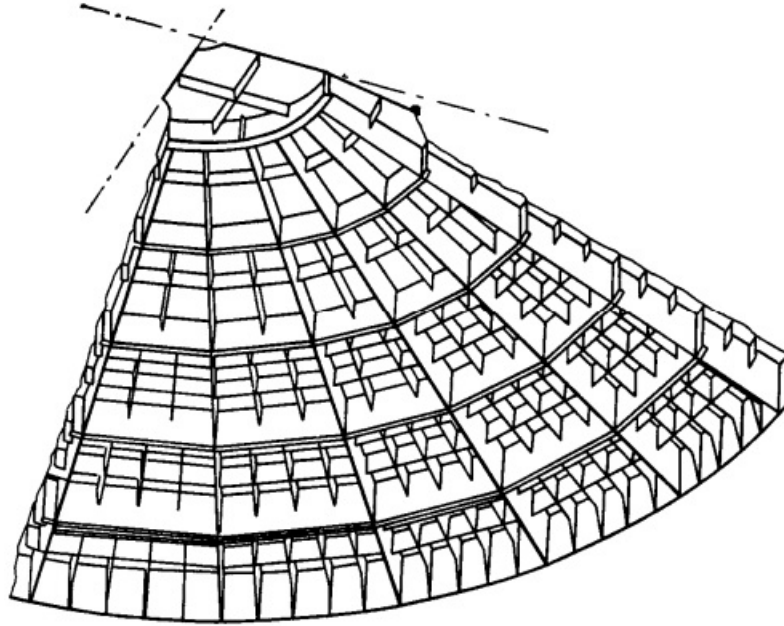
Strip section of a roof tank constructed from welded stiffened plates [17]
